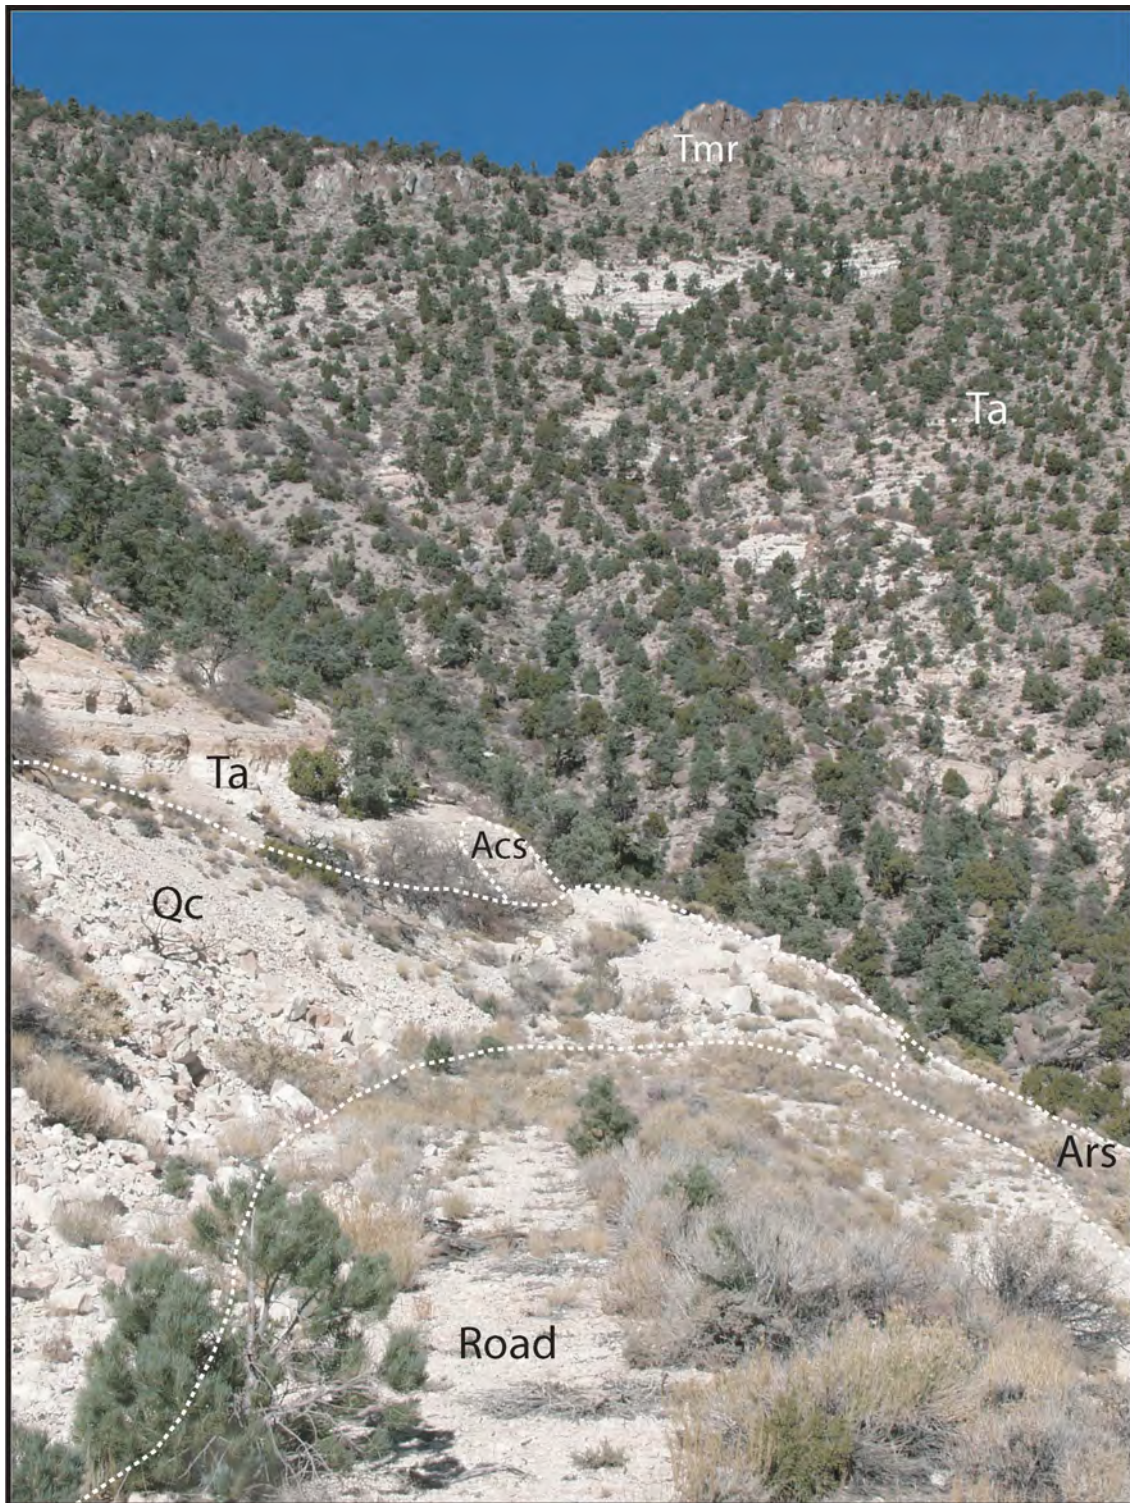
View north on road from upper pads above the U12n Tunnel portal area showing cut slopes (Acs) in bedrock and colluvium and a zone of road side-cast (Ars) along the access road. Colluvium from the upper slope and from the cut slope have covered a portion of the road making it impassable.
